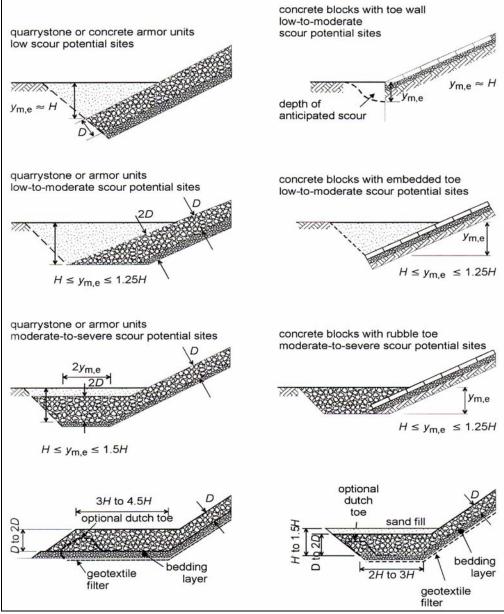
Some alternative toe protections (Pilarczyk et al, Dikes& Revetments, 1998) ( $y_{m,e}$ =scour depth; H= local wave height).
